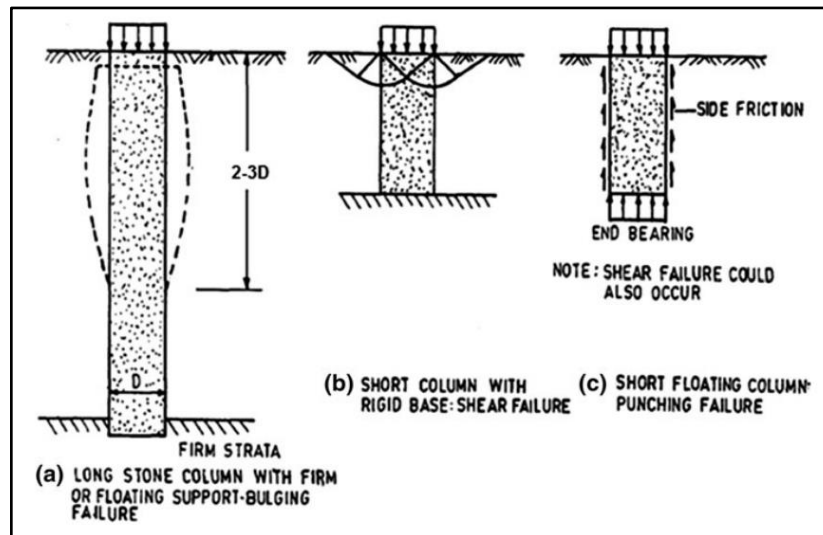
Failure mechanism of single stone column (a) Bulging Failure, (b) Shear Failure (c) Punching Failure (Source: Barksdale & Bachus, 1983)
